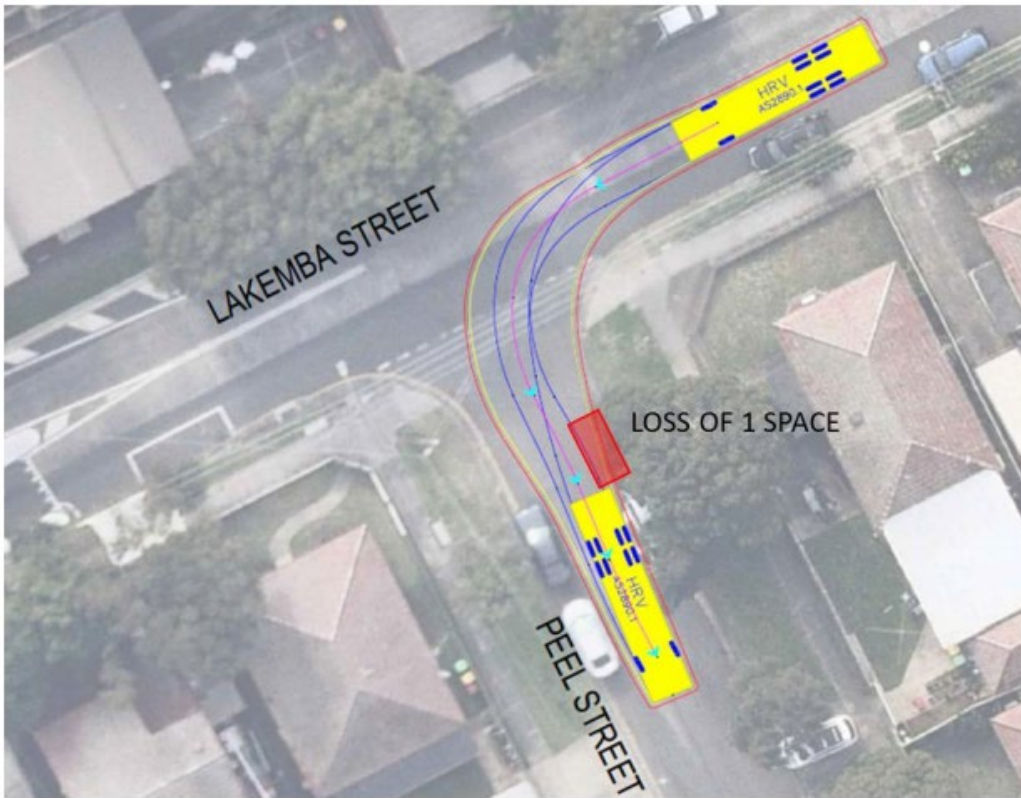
BE7 – M24 14.086D Parking Space Loss
